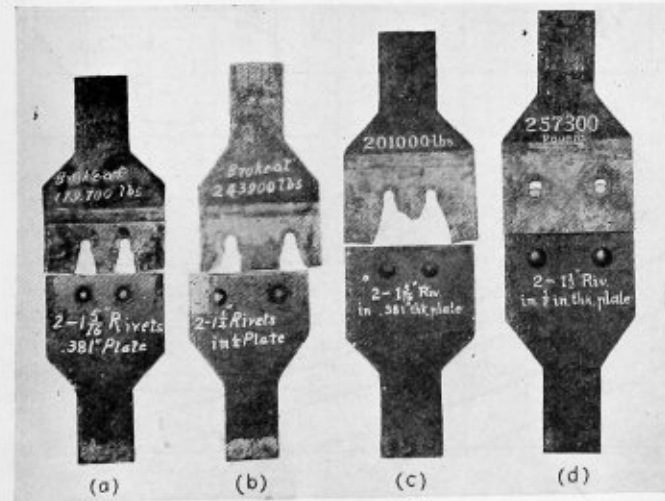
Examples of Riveted Test Specimen Failures
